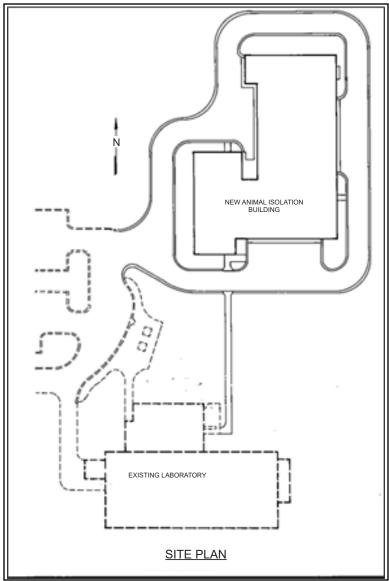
Architectural Drawing of NWHC Site Plan for Construction of the TIB, 1984 (USFWS 1984)
